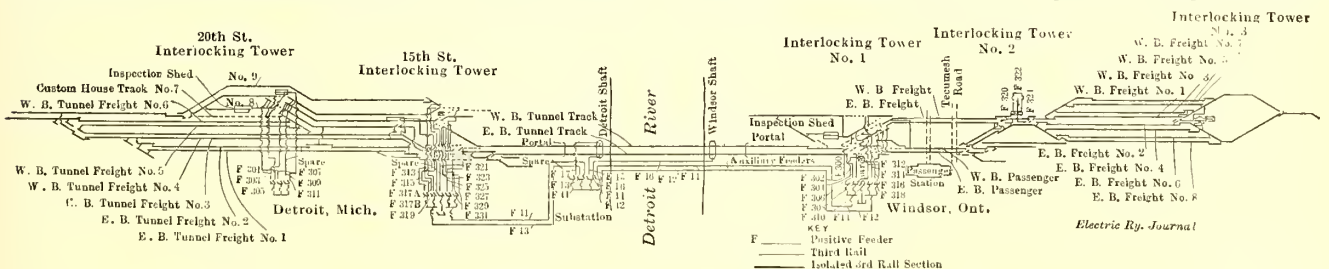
Detroit Tunnel—Layout of Third-Rail Feed and Jumper Connections
